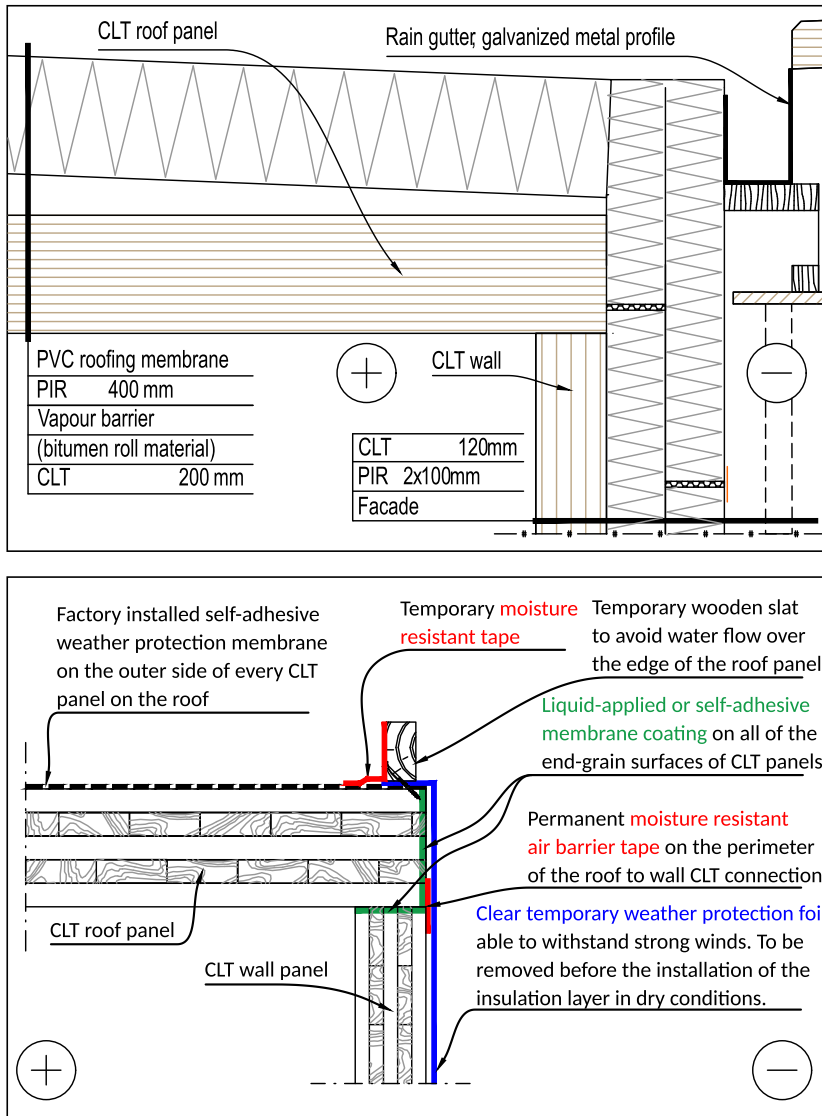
Design drawing (top) of the exterior wall to roof panel connection and an example drawing (bottom) of the moisture safety design drawing for the same area.
